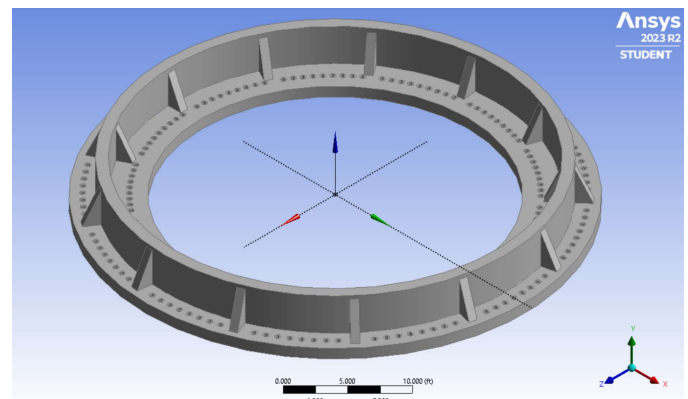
Base Plate's Final Design: Two Flanges with Single Layer of Bolt Each
